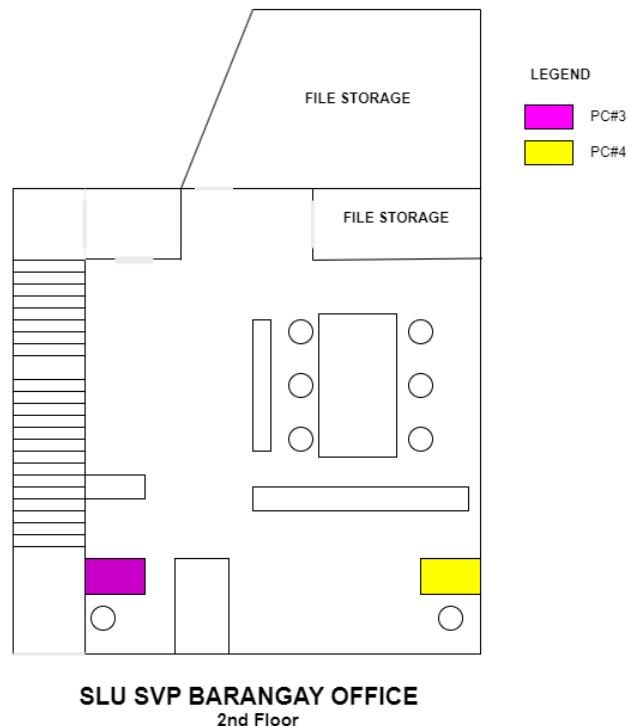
SLU SVP Barangay Office Floor Plan 2nd Floor
